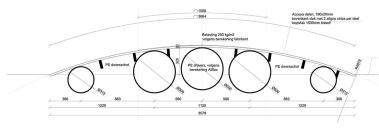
Detail of Ravelijn Bridge, Bergen op Zoom, RO&AD Architects
